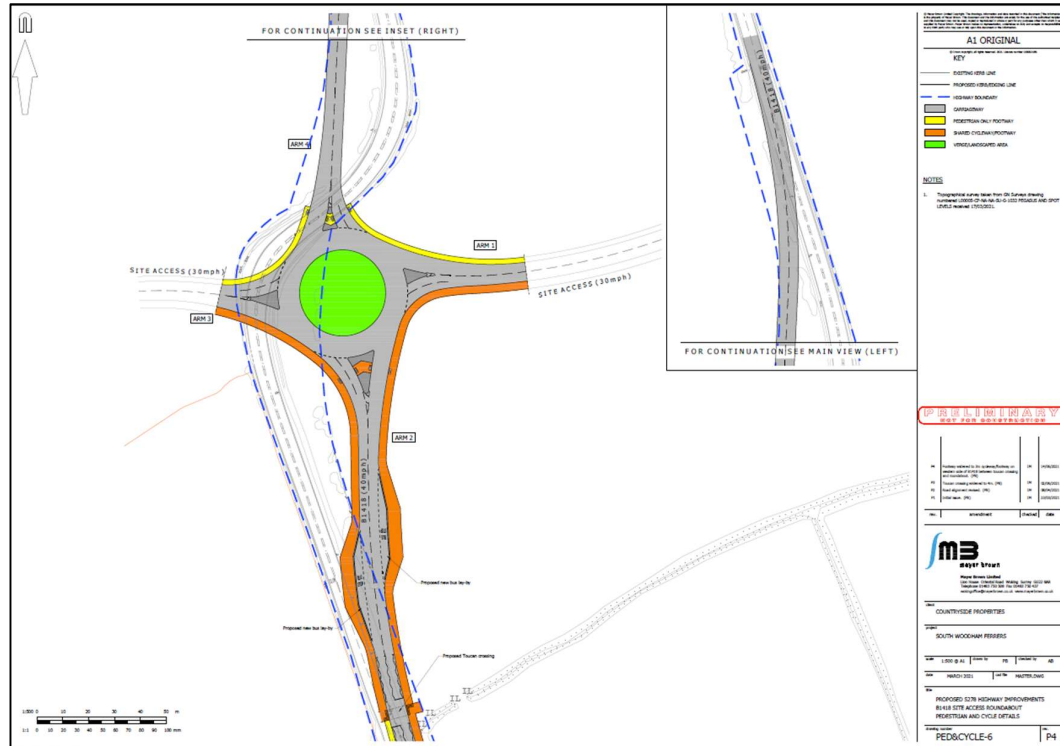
Proposed B1418/Site Access Roundabout Layout
